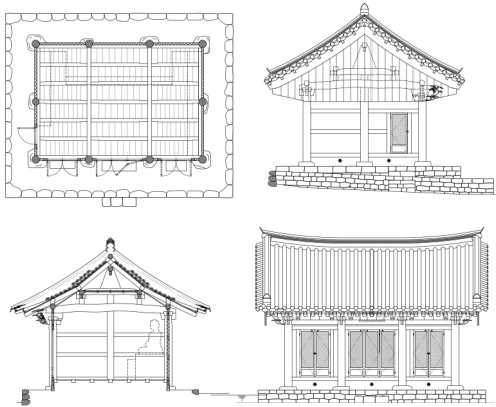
Gochang Sangwonsa Daeungjeon (Plane, Elevation, Side, Longitudinal section)
